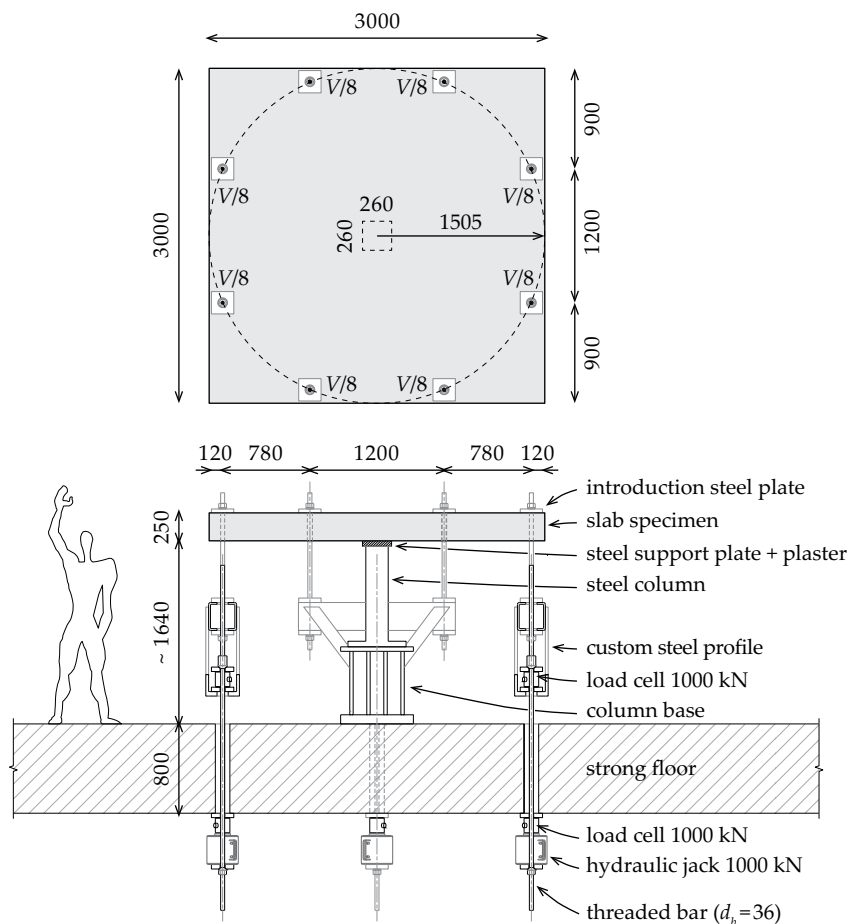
Characteristics of the test setup for the experimental campaign of punching tests on reinforced concrete slab specimens with transverse reinforcement (dimensions in [mm])
